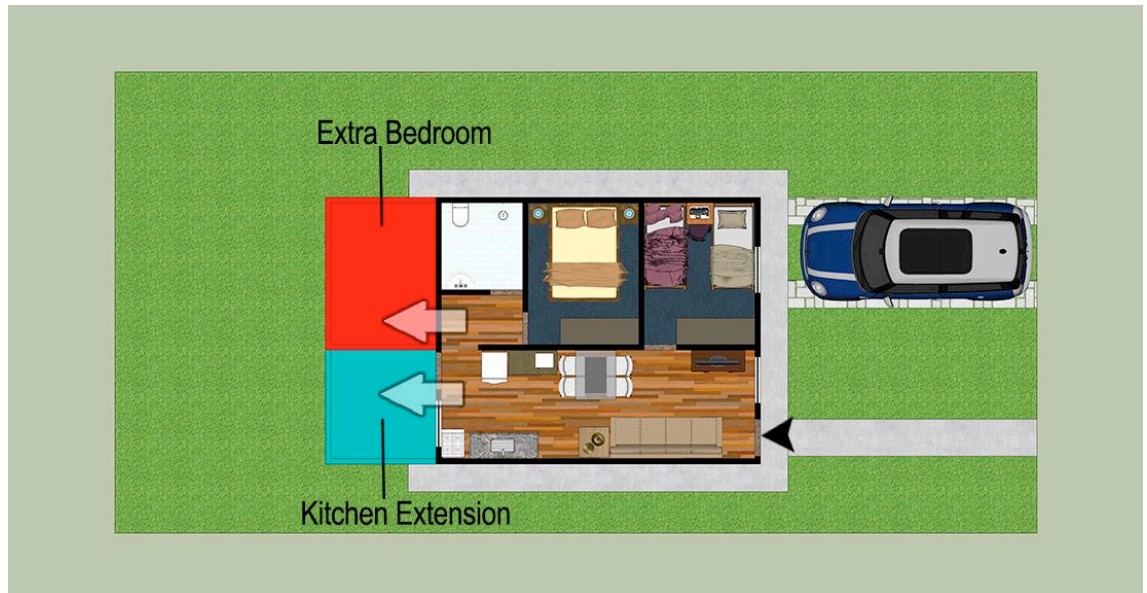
Sample model of an internal layout of a house with possibility for the construction of an extra bedroom and kitchen extension.
